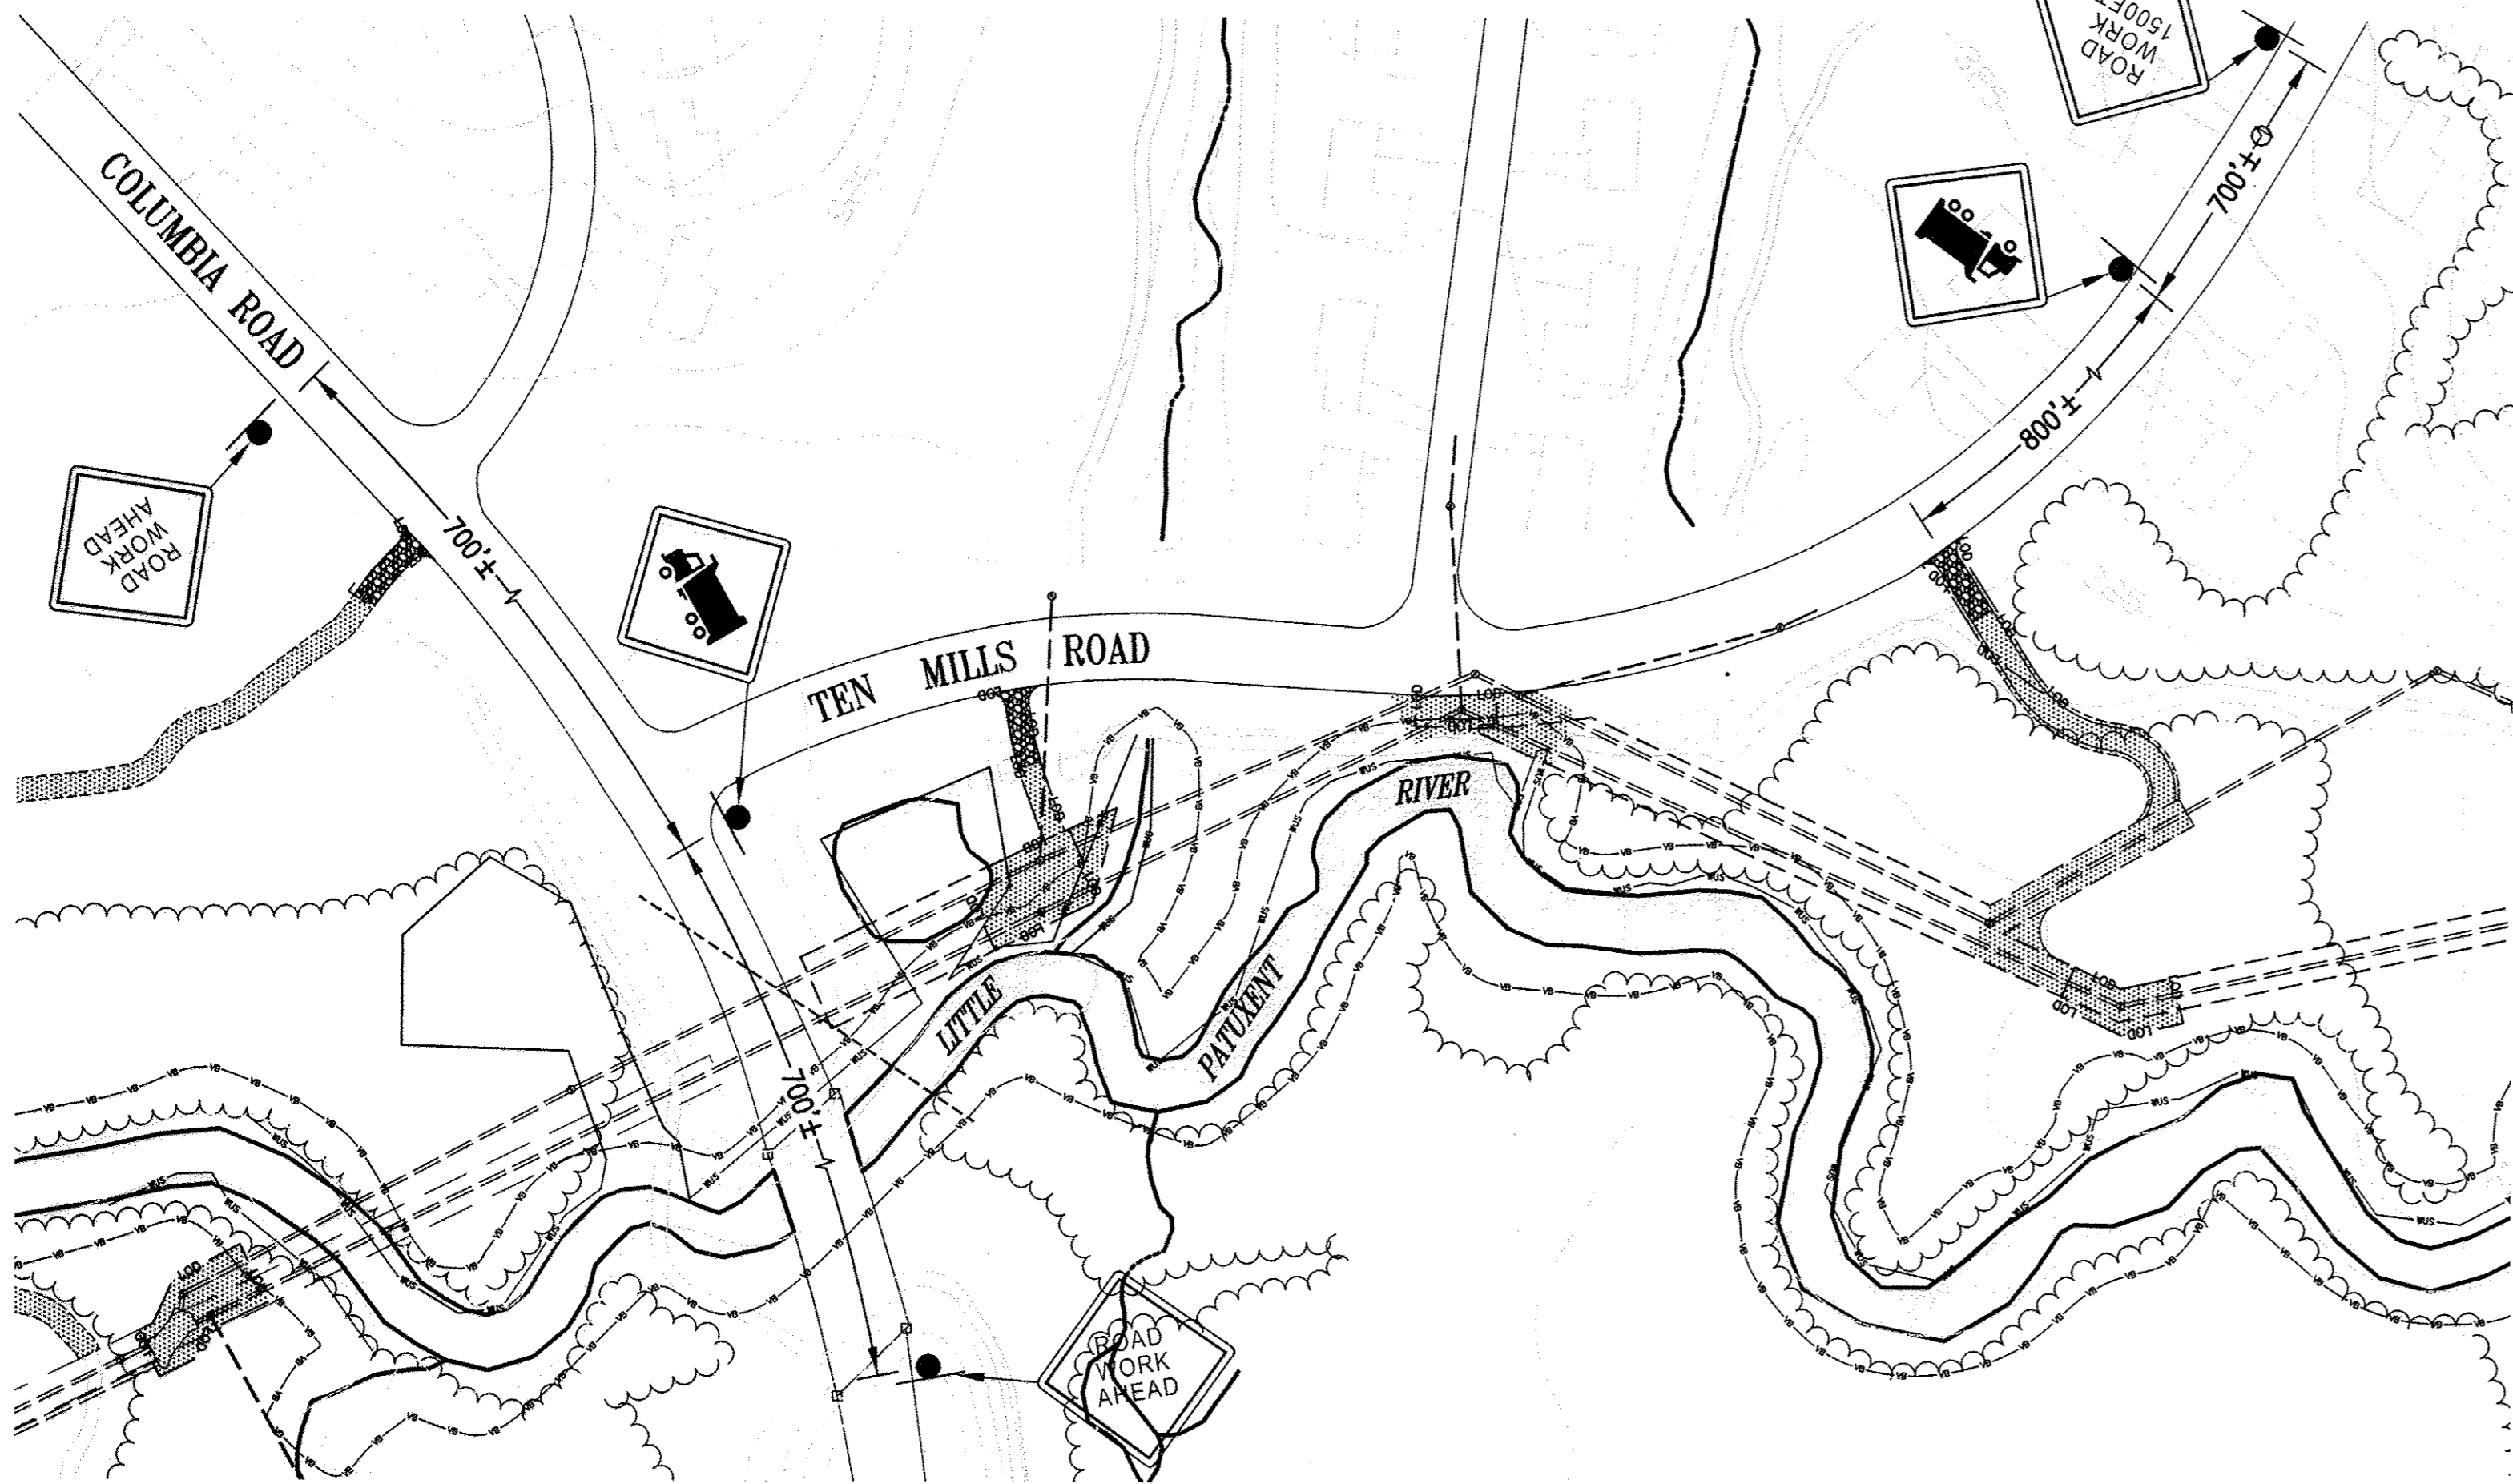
ACCESS ROAD MAINTENANCE OF TRAFFIC (SOUTH ENTRANCE ROAD)
